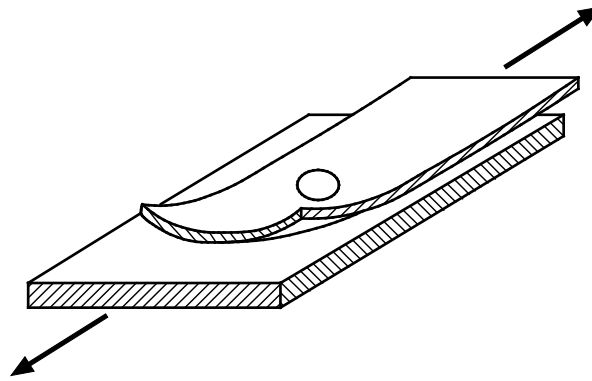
Out-of-Plane Distortion of Welded Connection
